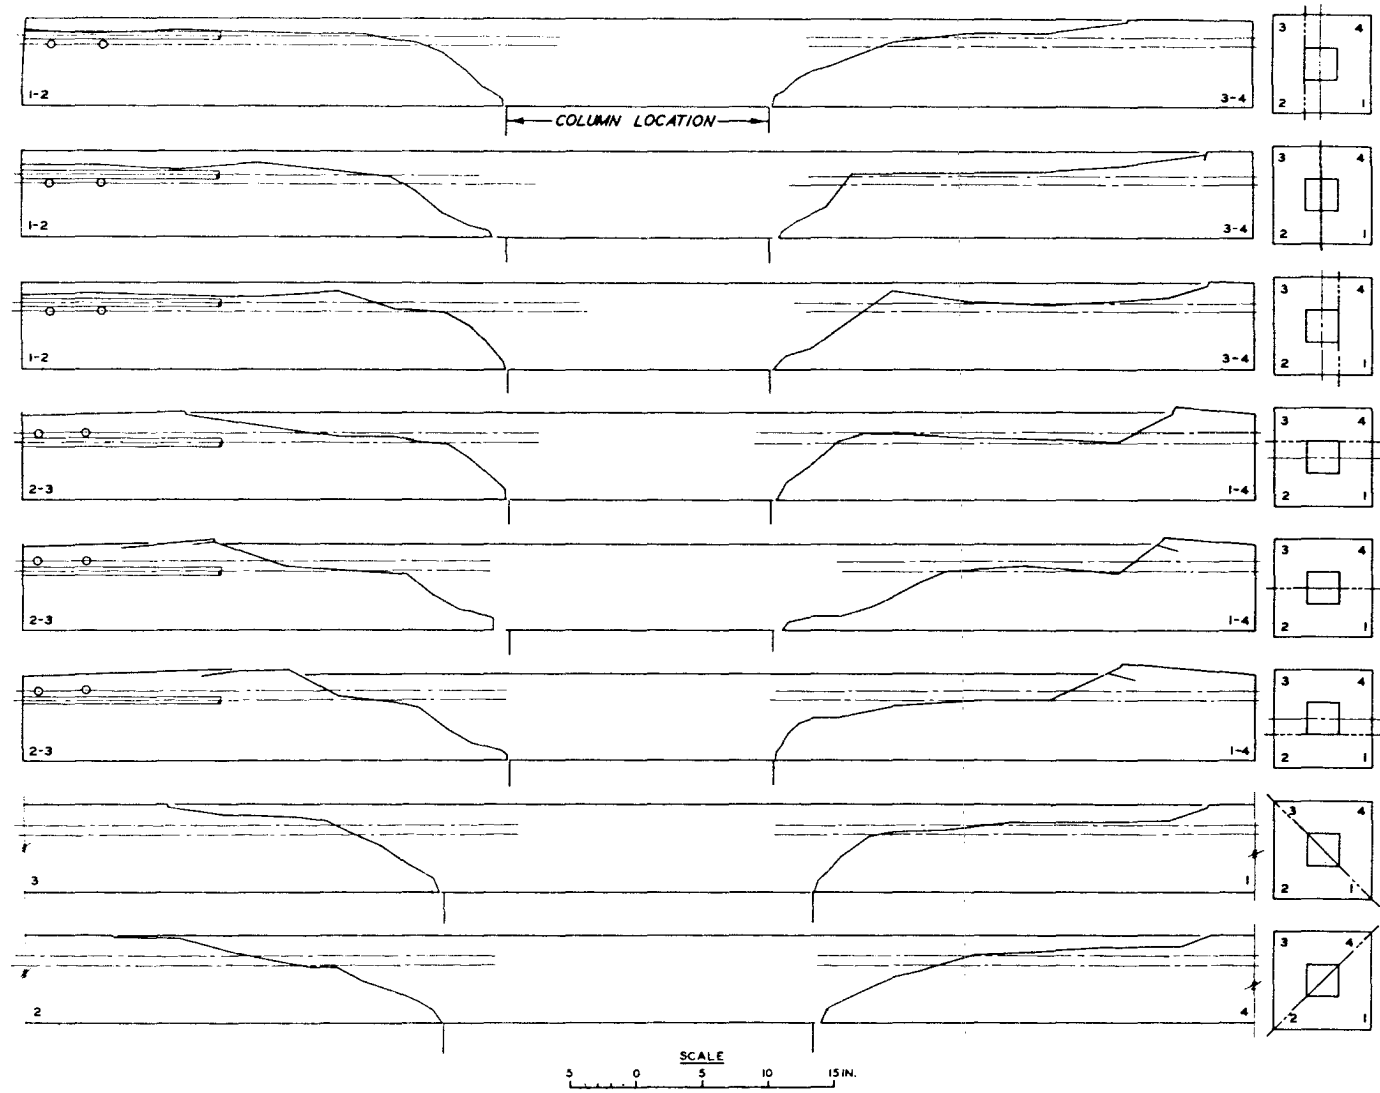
Profiles of slab failure surface, Specimen D4150-1.
